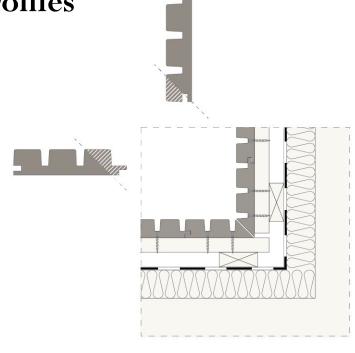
Internal corner finishing by cutting the board edges at a 45° angle
